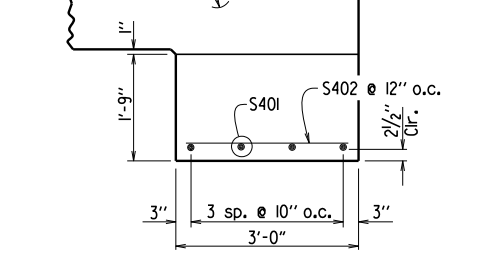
DETAILS OF LONGITUDINAL CONSTRUCTION JOINT
